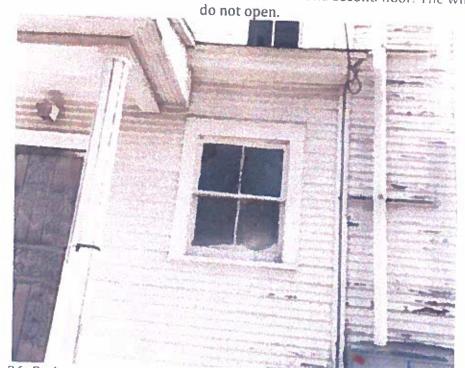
Bathroom window to the right of the kitchen door. The window has been replaced, but some original trim remains.
